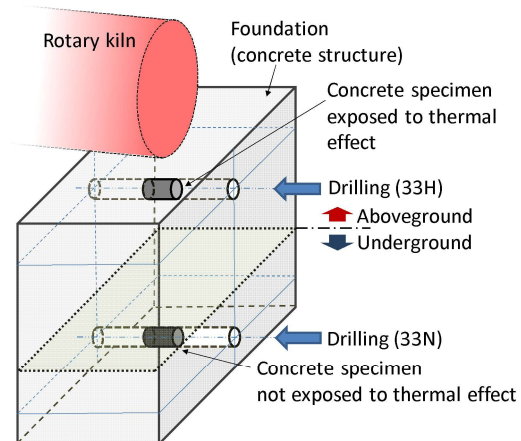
Sampling point of specimen ³³H and ³³N (foundation of cement rotary kiln).
